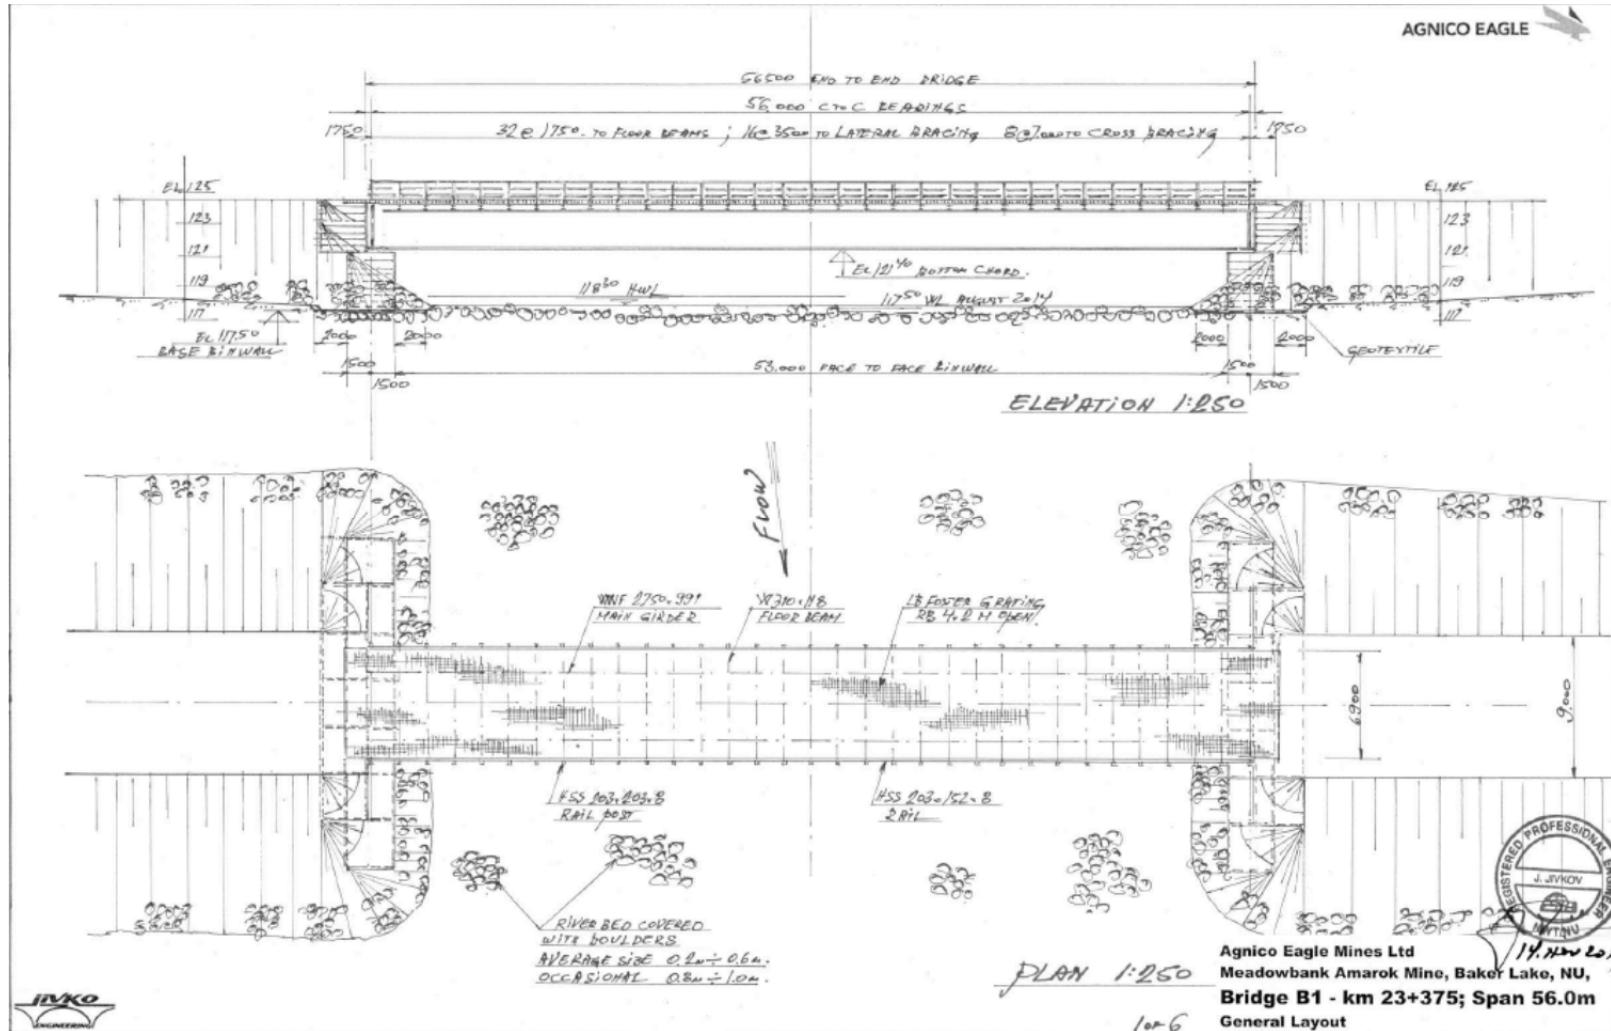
General Bridge and Arch Culvert Layouts
